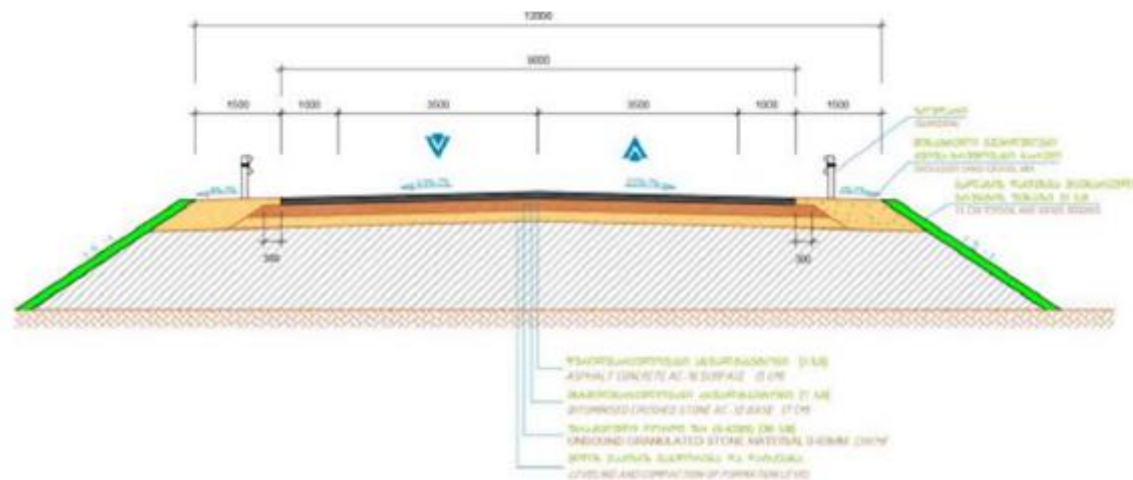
Typical cross section of two lane ramp with asphalt concrete pavement
